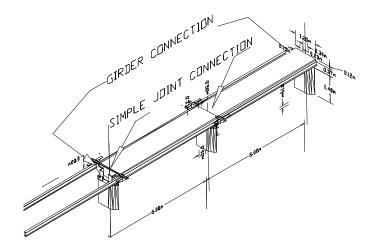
Bridge on overflow structure. It is built to pass traffic by twenty spans in 120m length of overflow. Two steel beams are placed to transfer moment and torsion into new opener connection.
